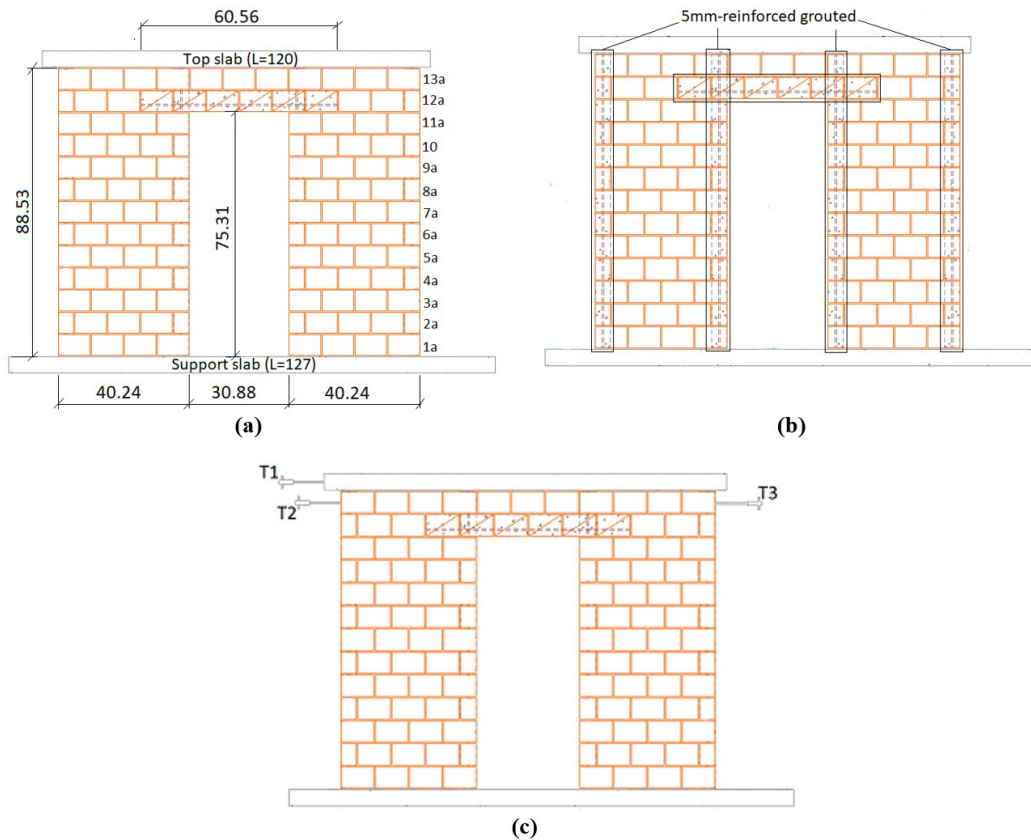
Walls with door opening. (a) PPSG1 Wall; (b) PPCG1 Wall; (c) Displacement measurement locations. Measurements in centimeters (Source: adapted from Nascimento [2]).
